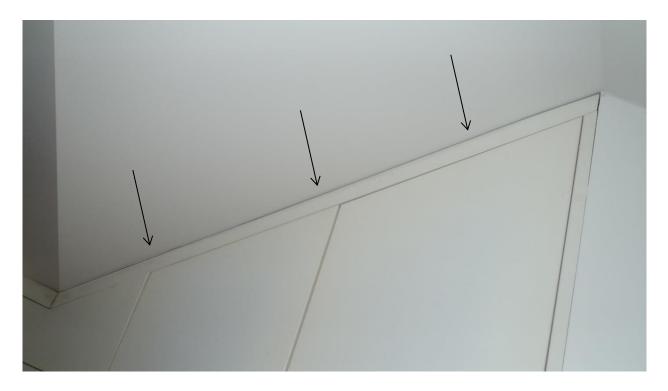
shows vertical cracking the wall junction of the *common party wall* (south eastern corner of the dining room).
